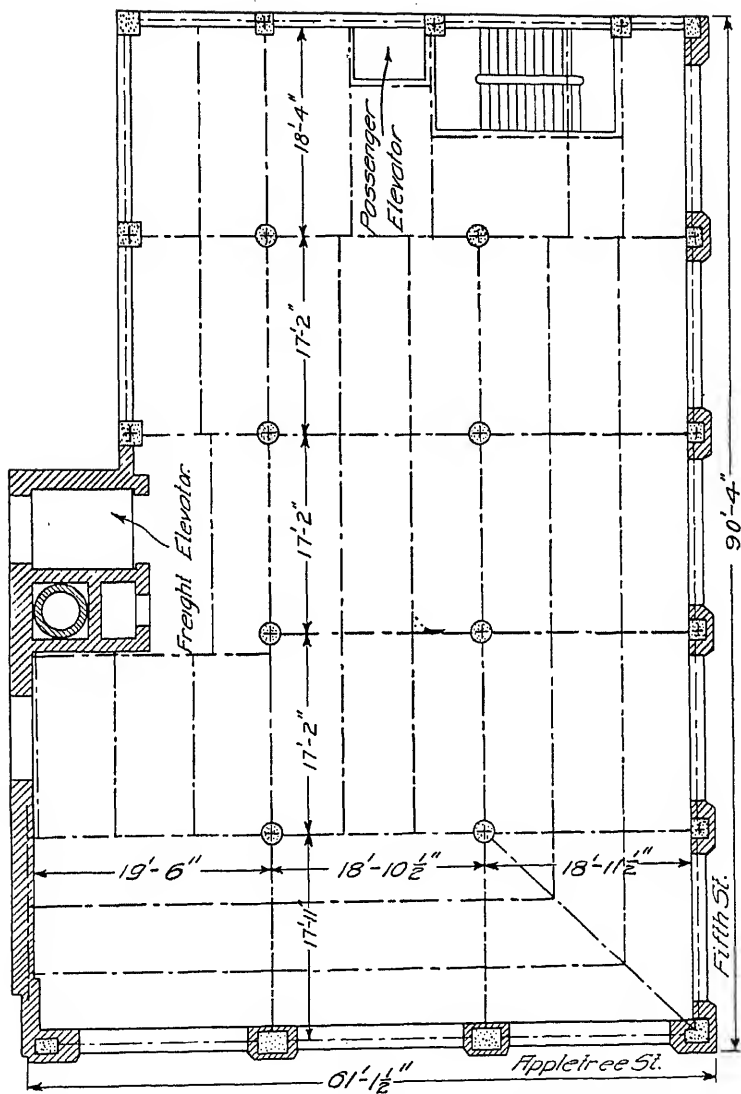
Typical Structural Floor Plan of Buck Building, Philadelphia, Pennsylvania
